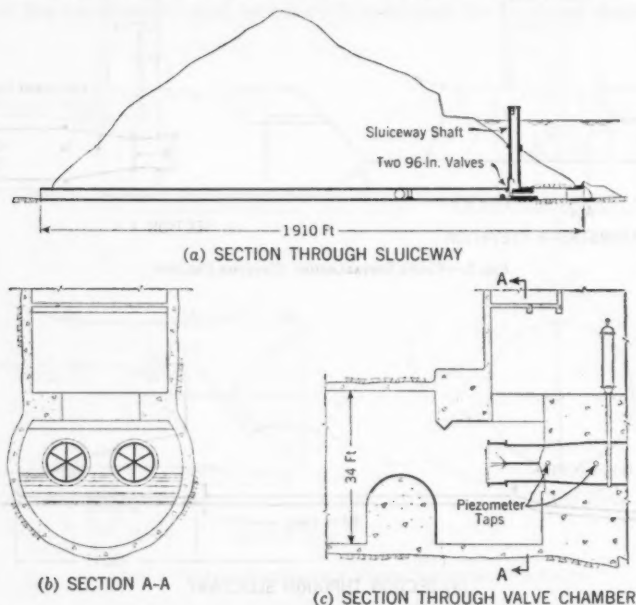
VALVE INSTALLATION, WATAUGA PROJECT
